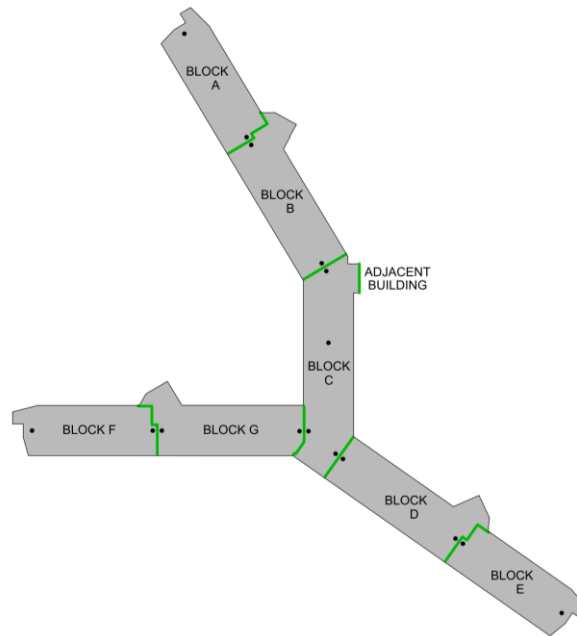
Plan view of the building, showing expansion joints in green, independent blocks, maximum dimensions, and accelerometer location (black dots).
